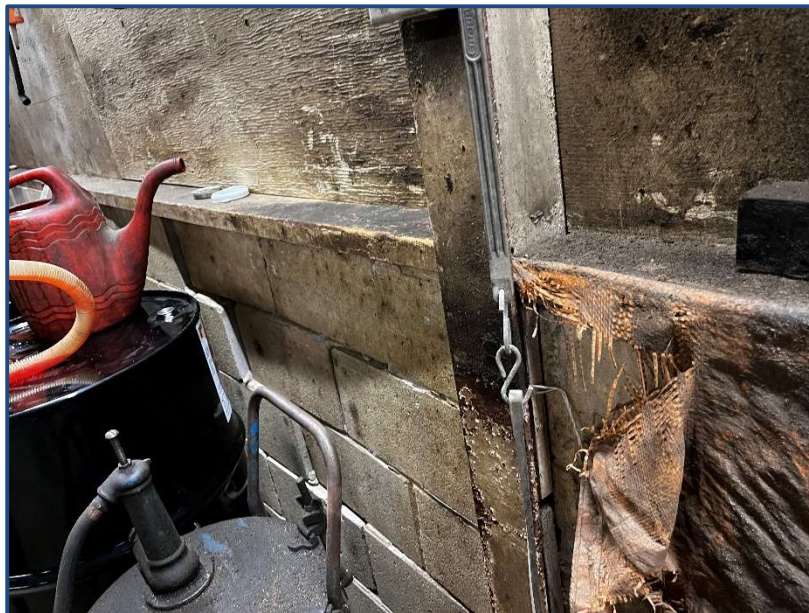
Corroded Metal Siding – Interior of Garage No. 2
